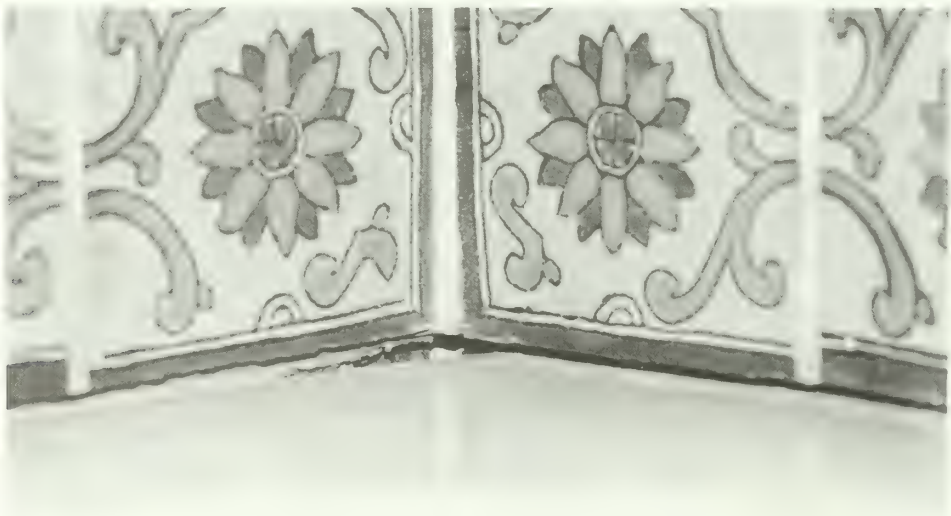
Separation of tile from edge of bathtub, Annex bathroom. (Photo by R. Silva)
